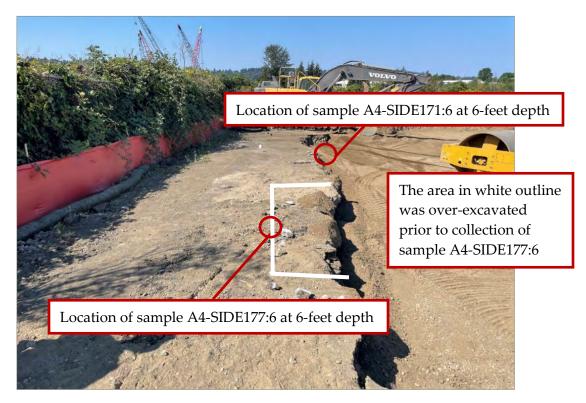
View of Proximity to Shoreline Berm Downslope to Samples A4-SIDE171:6 and A4-SIDE177:6. View direction is west. Photo taken on August 31, 2022.
